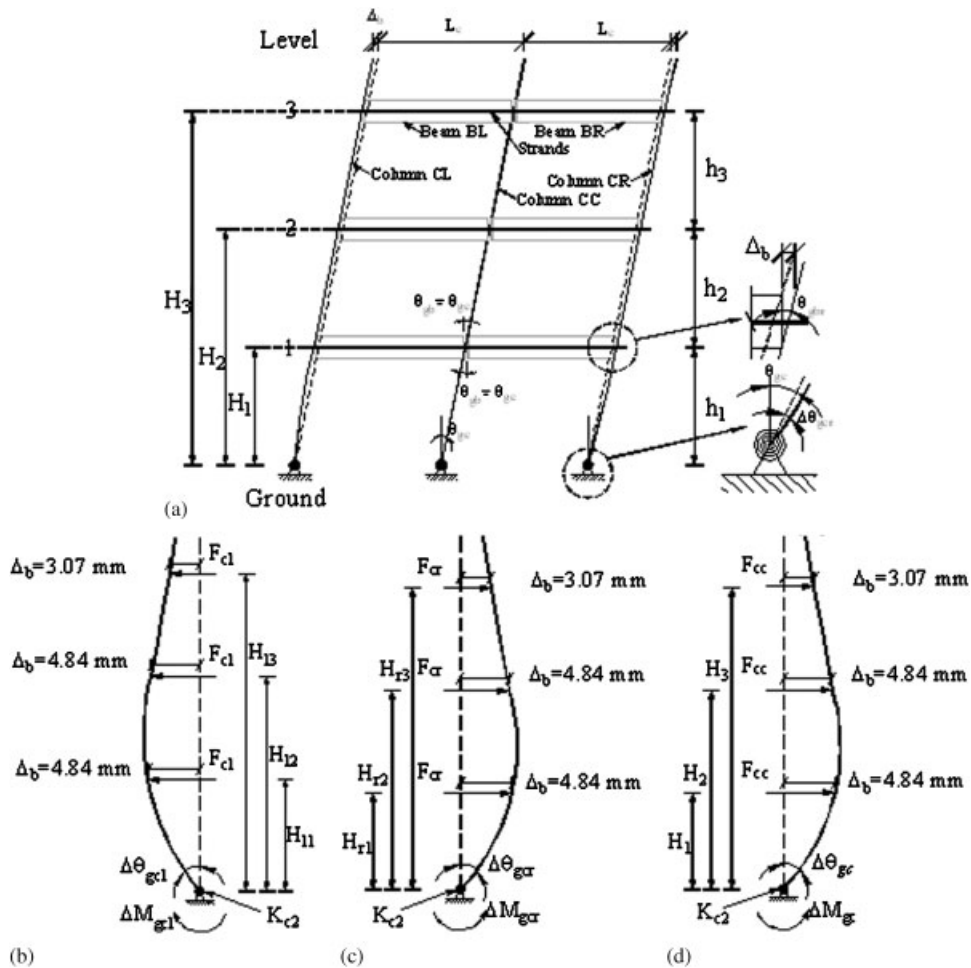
Three-story PT frame and exterior column deformation: (a) PT frame deformation; (b) column CL; (c) column CR; and (d) beam-to-column centerline intersection.
